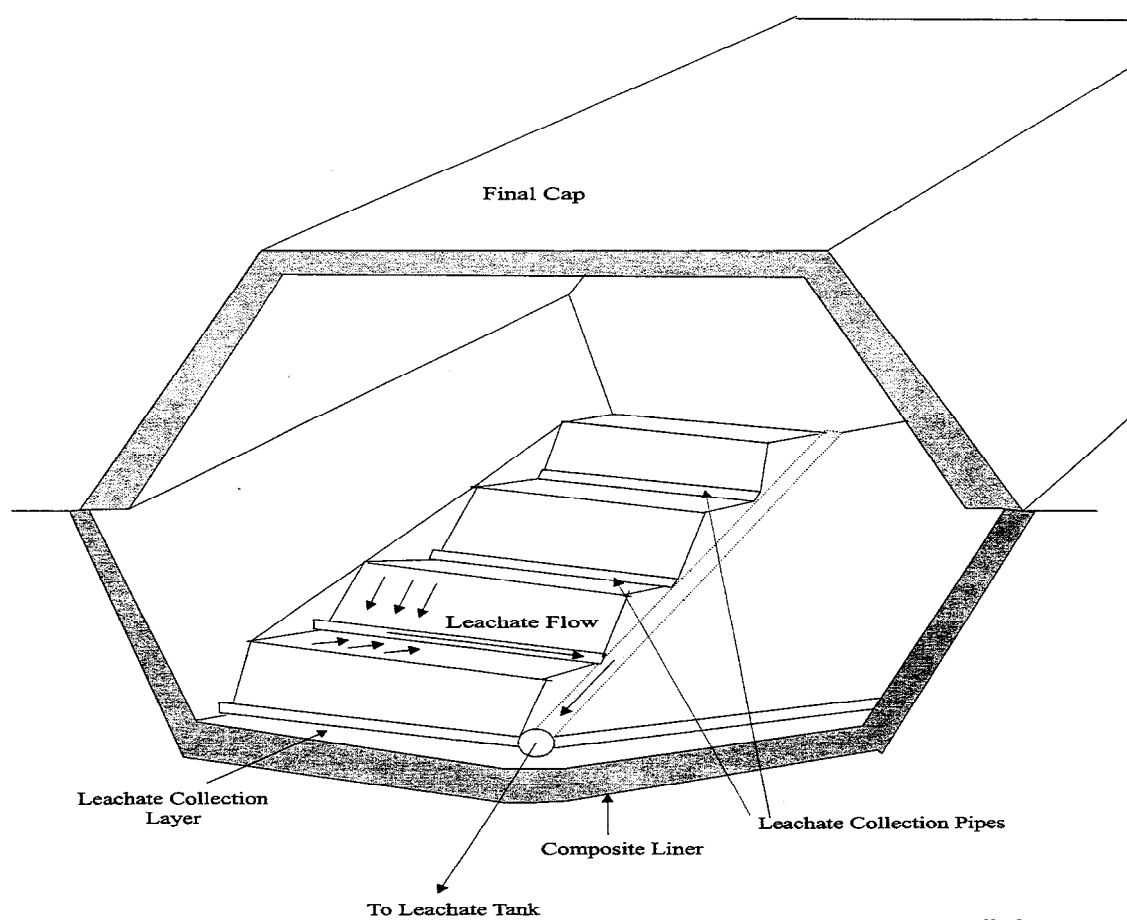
shows a cross section of a landfill with a leachate collection system installed.
